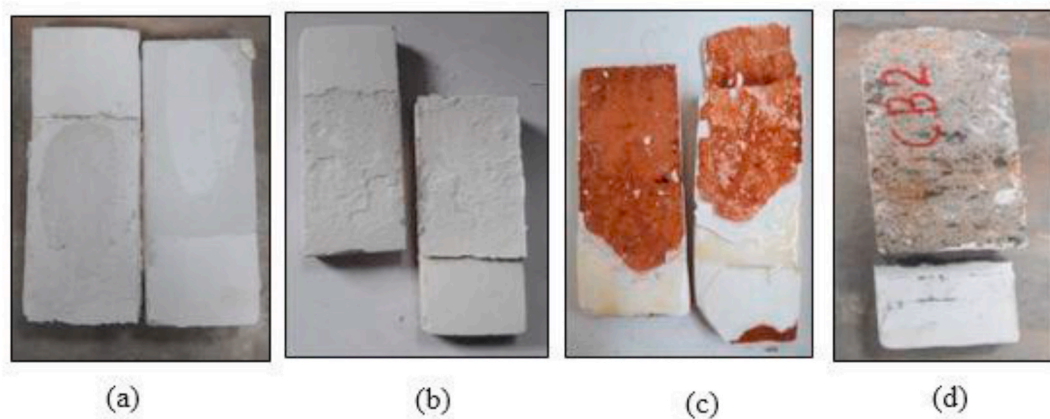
Failure types; (a) Adhesive failure, (b) Cohesive failure, (c) Fiber-tear failure, (d) stock break failure.
